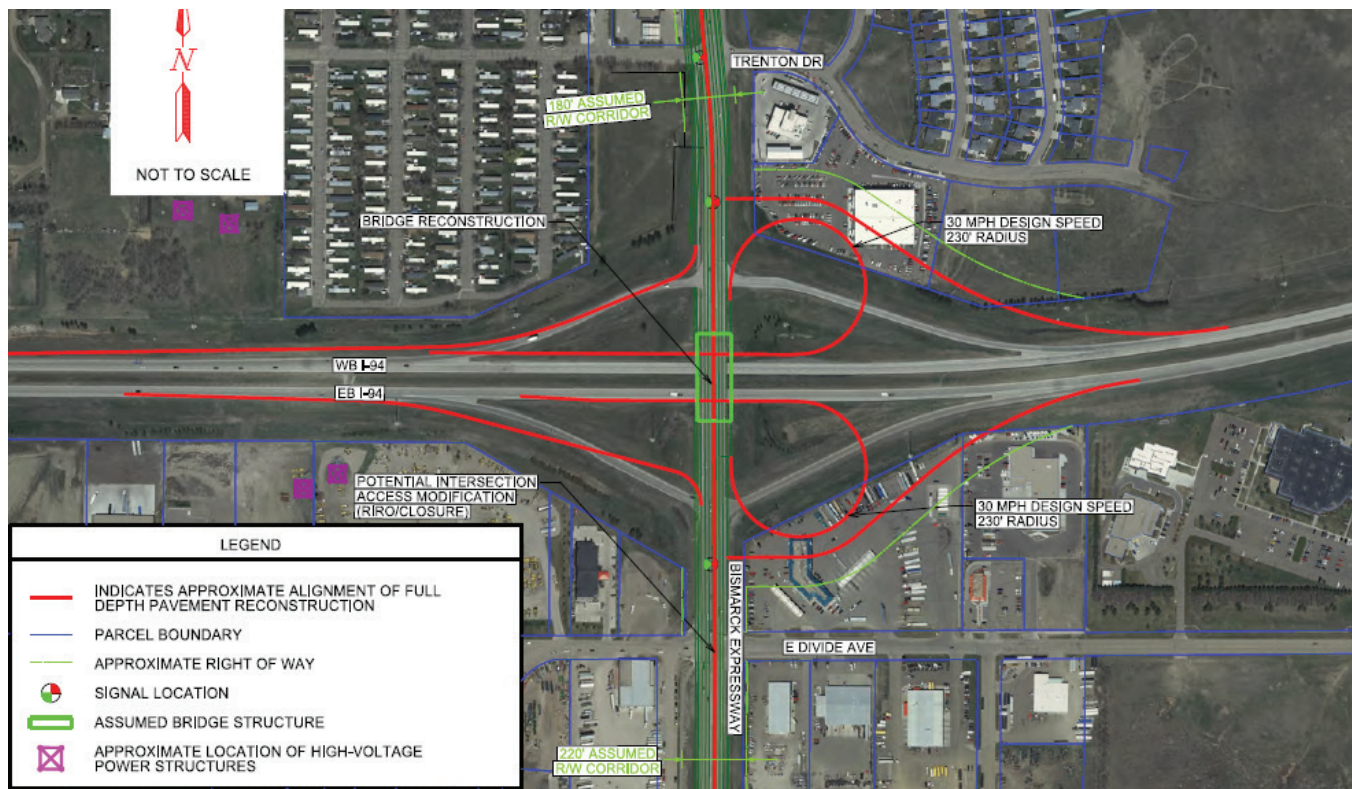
Northeast and Southeast Loop Ramp Alternative from I-94 Corridor Study
